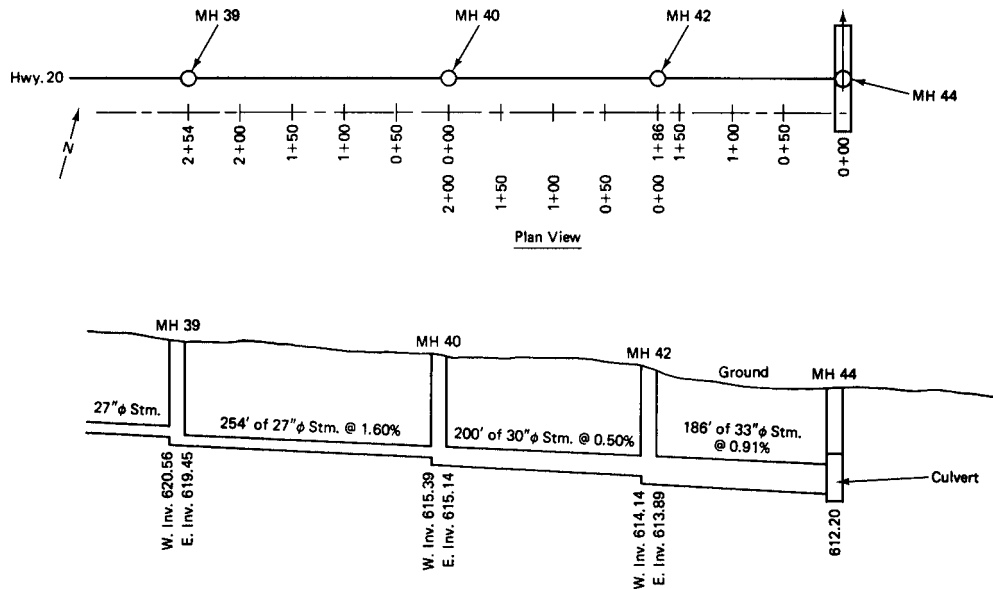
Layout sketch for sewer construction. Adapted from the plan and profile of Highway 20 (slope percentages computed from given inverts and distances).
